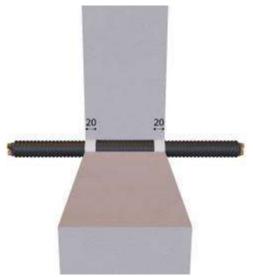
Seal of a corrugated pipe with cables in a rigid wall.
